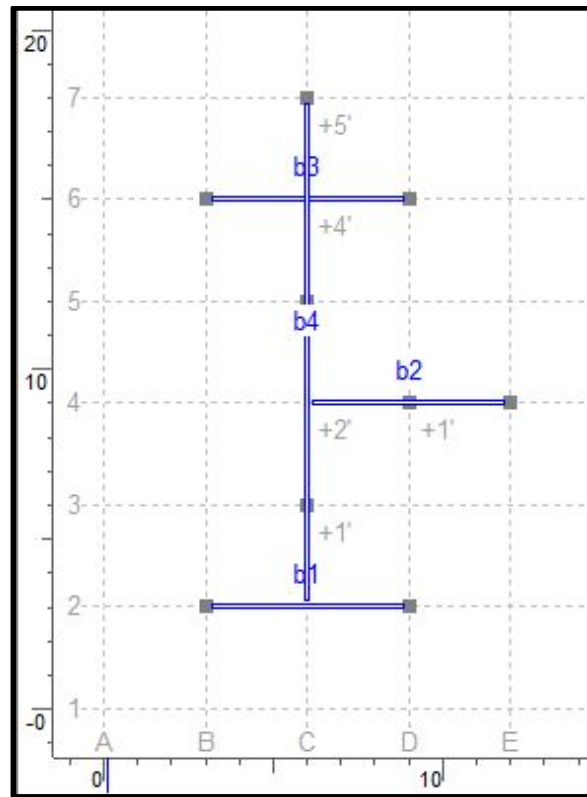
Sloped Beam Supported by more than 2 other Beams Top View
